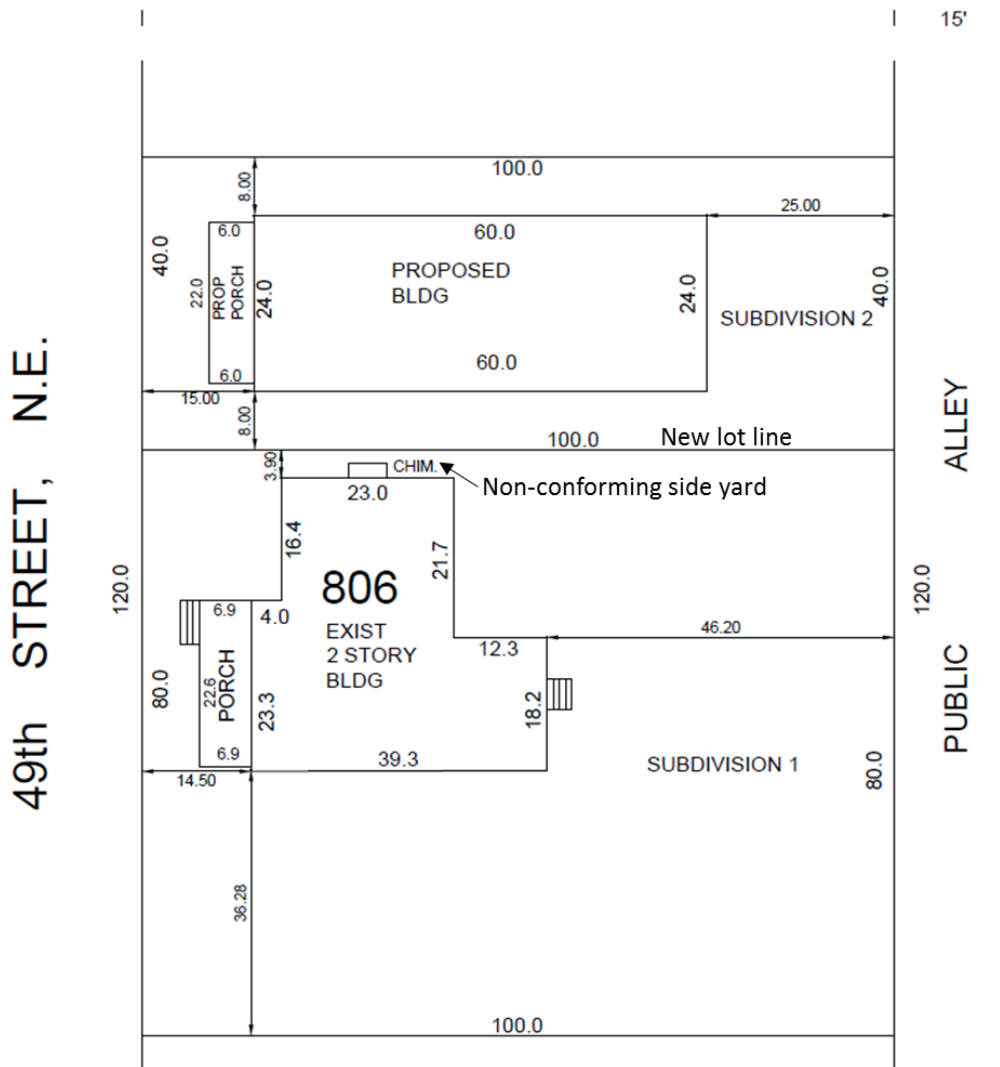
Existing Lot and House with Requested Side Yard Reduction, and Proposed Future Subdivision and Additional Detached House
